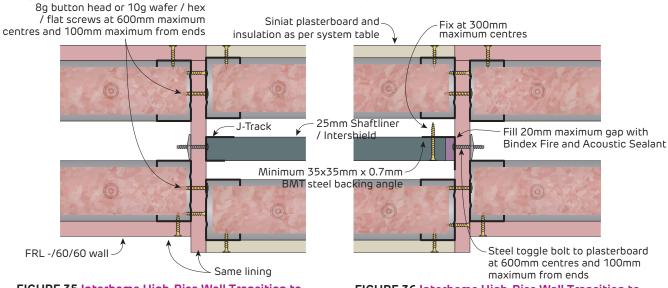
Interhome High-Rise Wall Transition to Double Stud Fire Rated Plasterboard Wall
